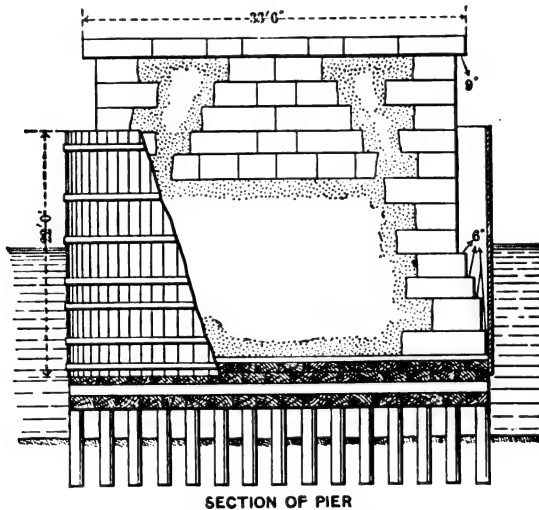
COFFER-DAM ON GRILLAGE. FORT MADISON BRIDGE, ATCHISON, TOPEKA AND SANTA FE RAILWAY.
